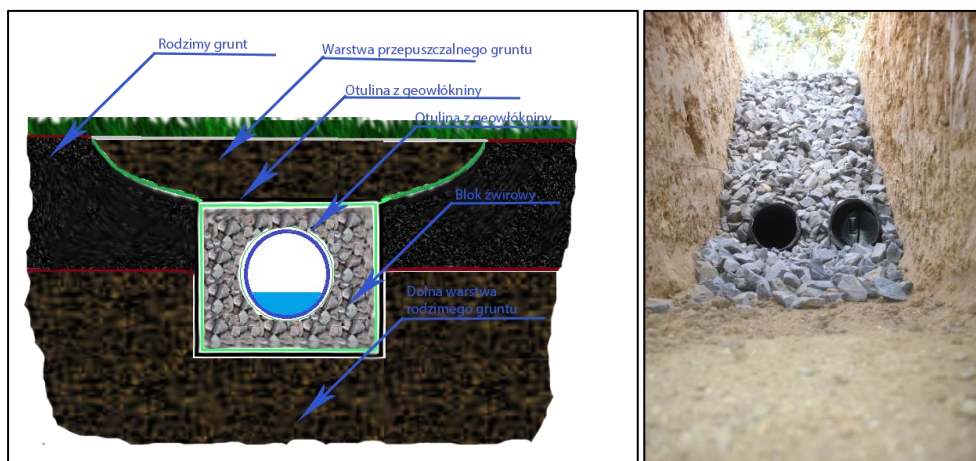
Mitigation technique Hydraulic barrier french drain
